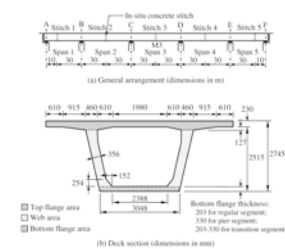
Configuration of the bridge analysed: (a) general arrangement; and (b) deck section (not to scale).
